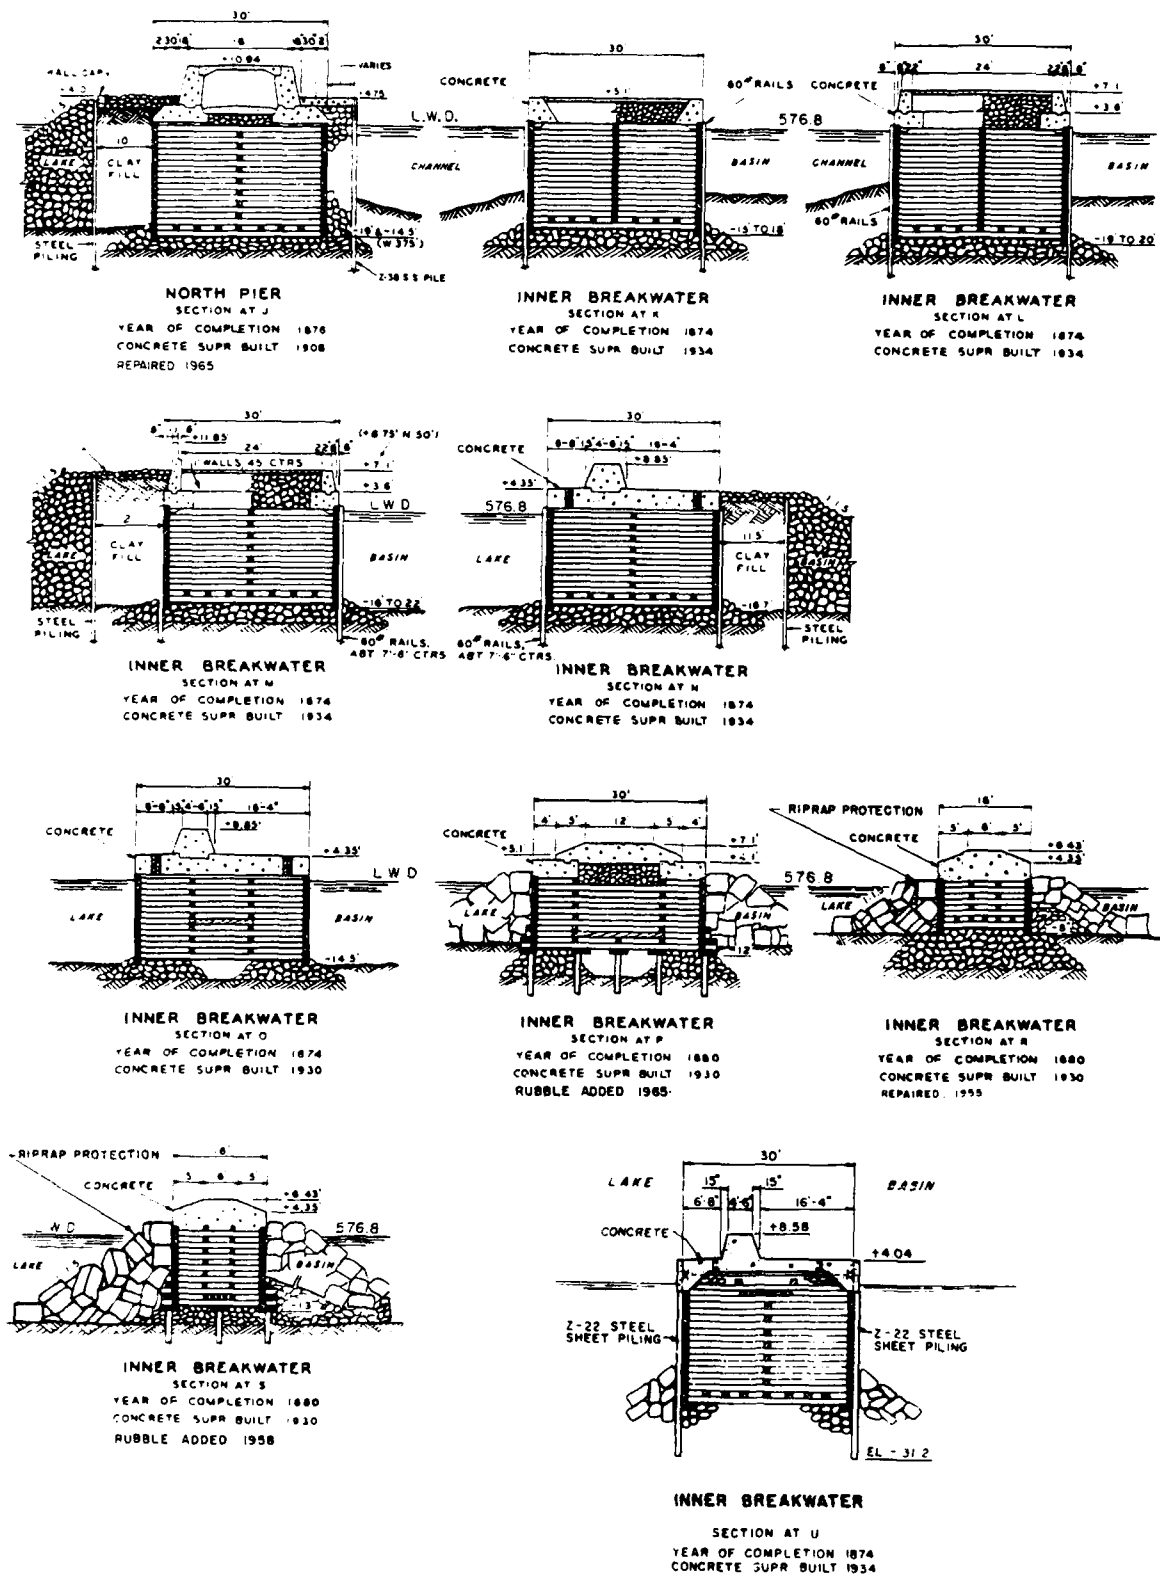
Typical structure cross sections, Chicago Harbor, Illinois
